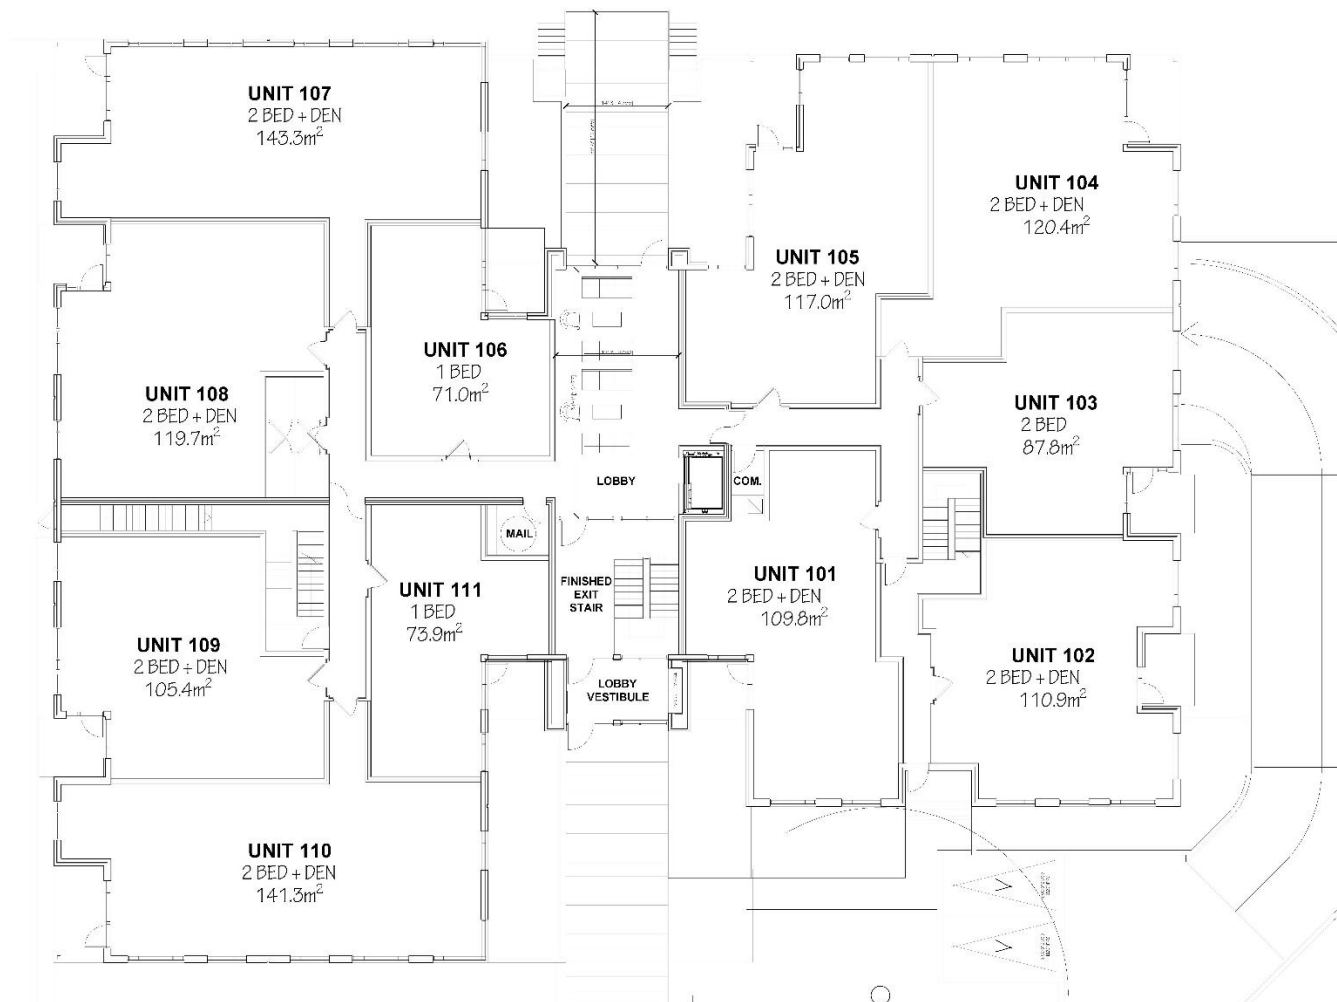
Ground Floor Plan (Source: Hobin Architecture).
